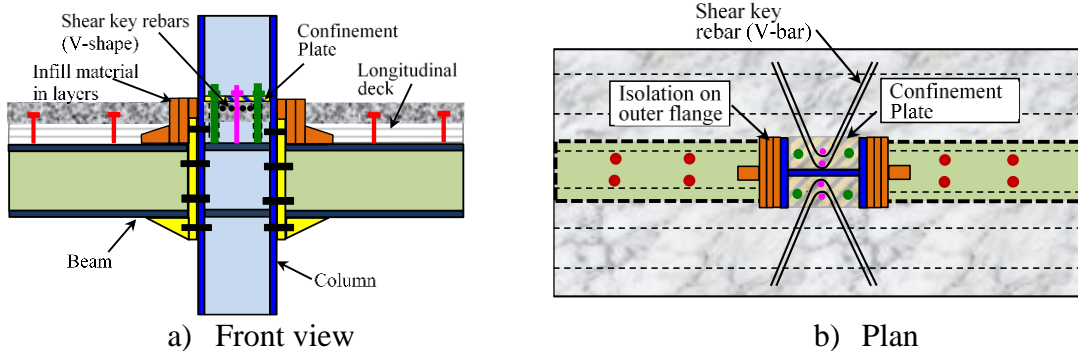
Modified Shear Key Slab Unit (MSK-SU) Test Sub-assembly
